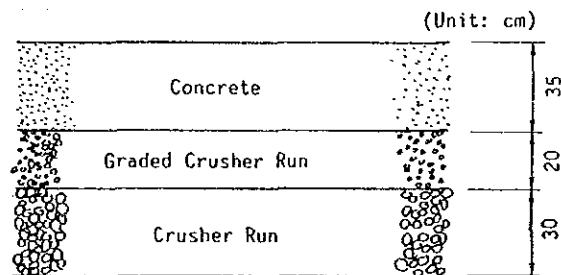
Standard Cross Section of Transfer Crane Track
